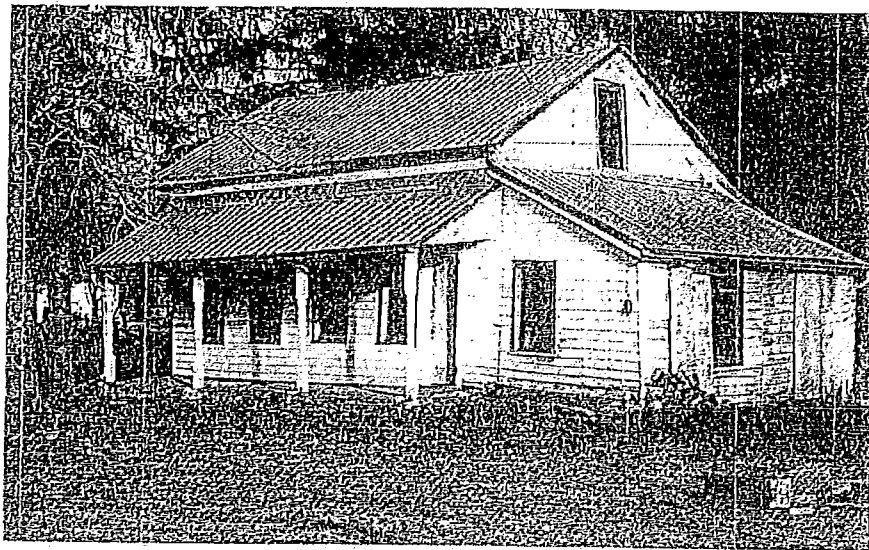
Non-historic materials are appropriate for mothballing projects when they are used to protect historic evidence remaining for future preservation. This lightweight aluminum channel frame and roofing covers the historic wooden shingle roof. Galvanized mesh panels secure the window openings from intrusion by raccoons and other unwanted guests. Photo: Williamsport Preservation Training Center, NPS.
